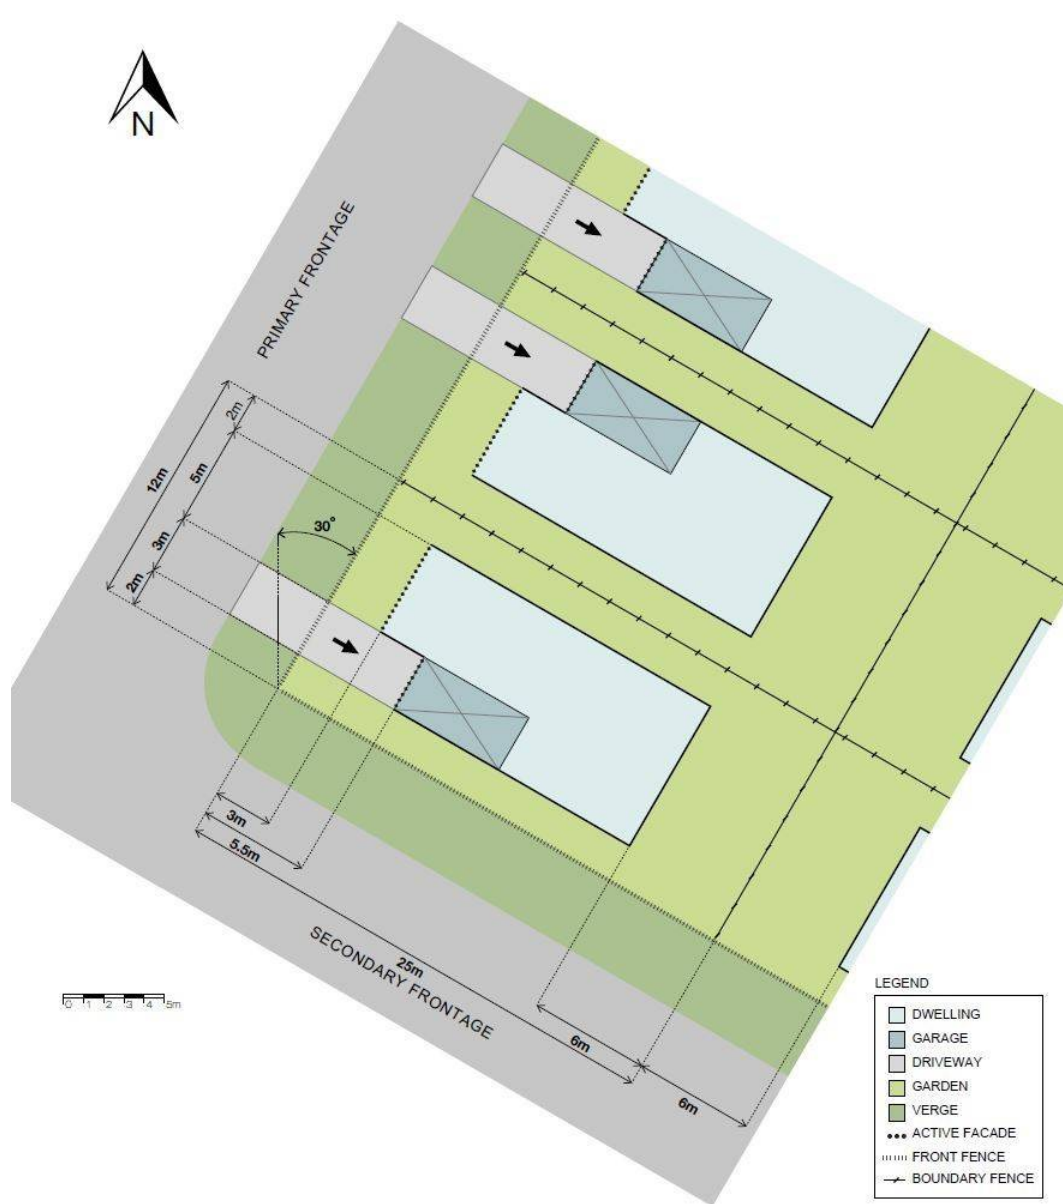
Example lot and dwelling layout of dwellings within Precinct A designed in accordance with the acceptable solutions under clauses BRI-S9.7.2.1, BRI-S9.7.2.3, BRI-S9.8.1, and BRI-S9.8.6.1, where access is from the primary frontage and the lot frontage is not between 30 degrees east and west of north
